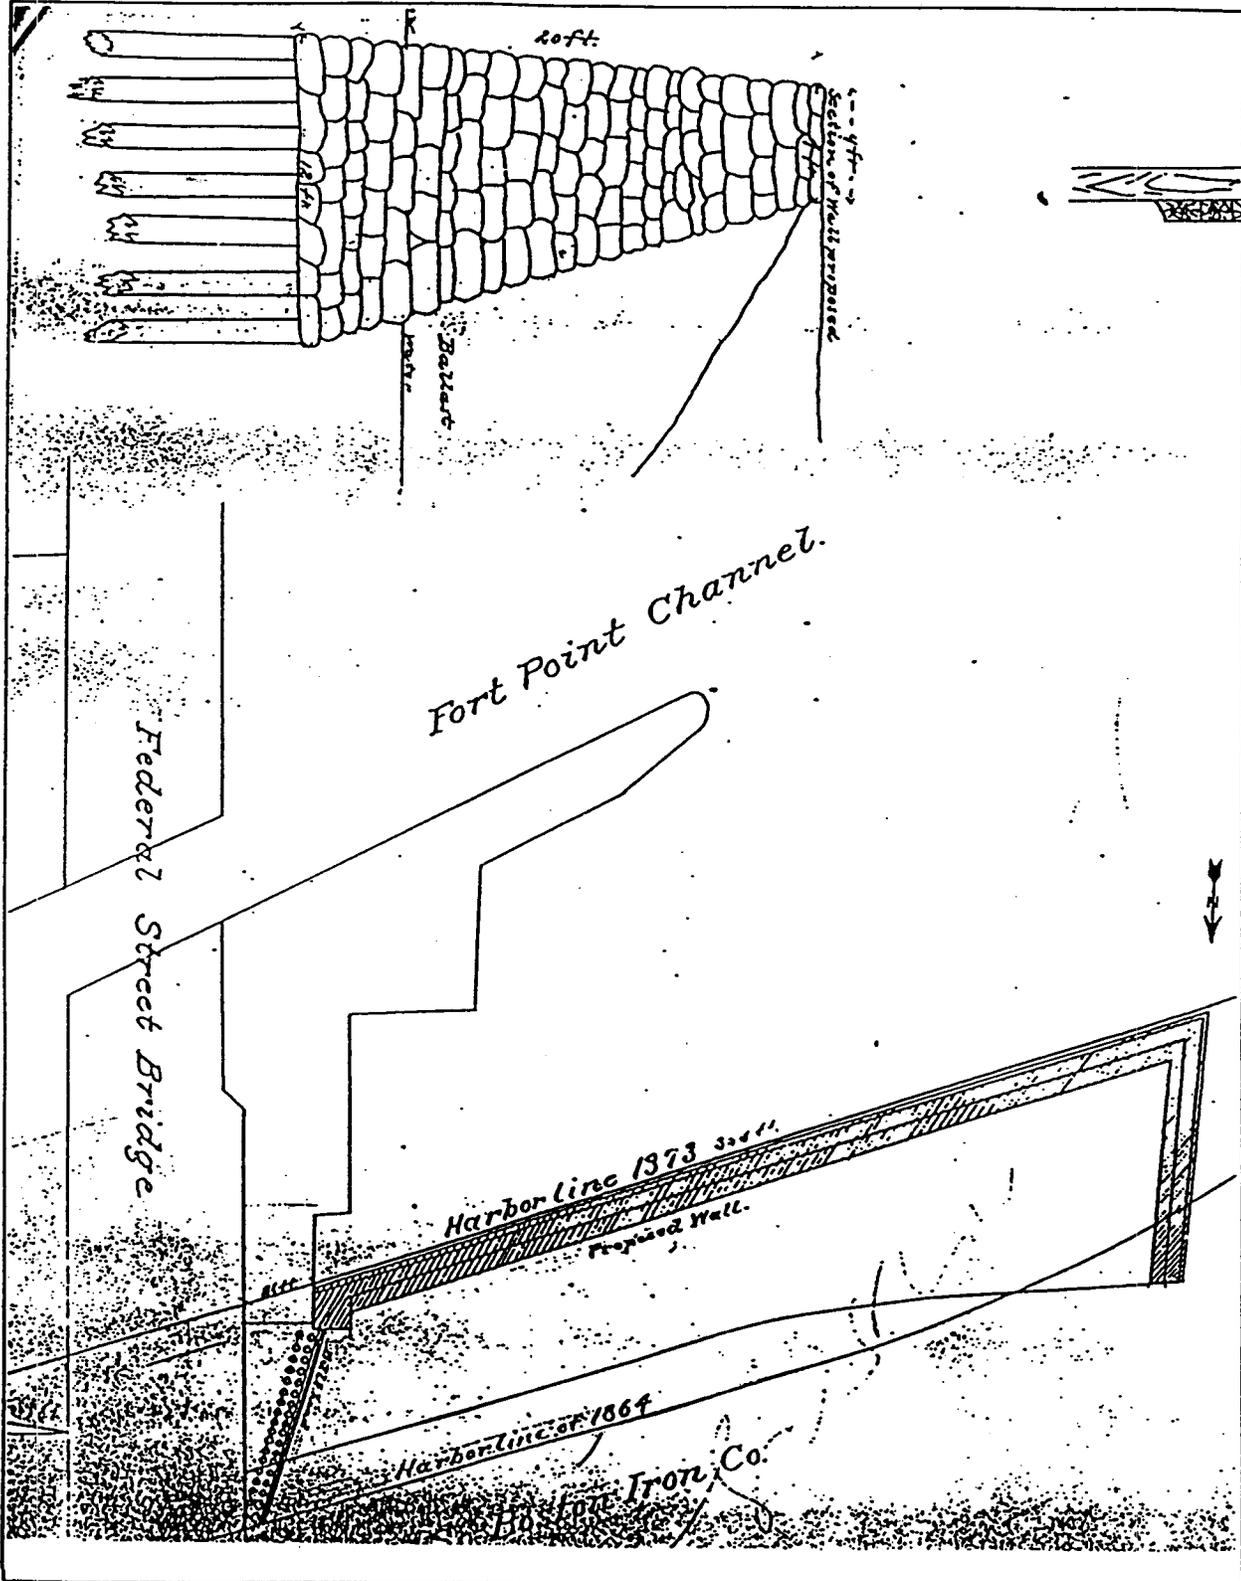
Proposed seawall north of Dorchester Avenue Bridge, east side of Fort Point Channel, ca. 1880s.
